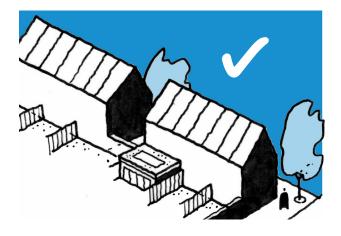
A typical ground floor single storey extension to the rear of the property would not cause any significant overshadowing and would generally be acceptable.
